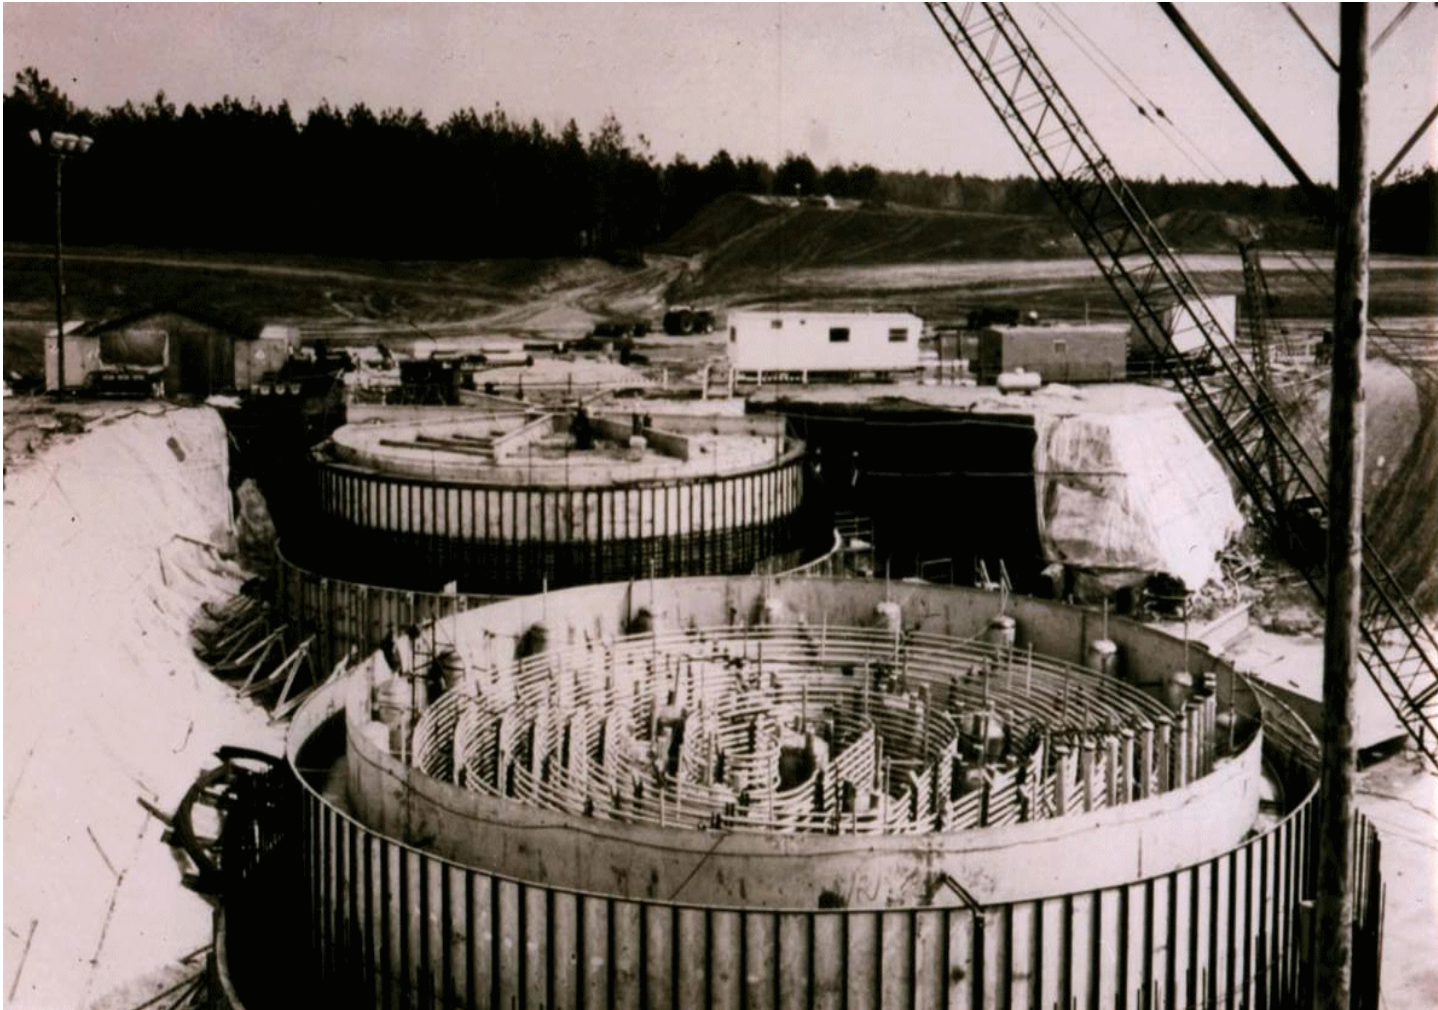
Tanks for liquid HLW storage under construction at the BNFP facility
